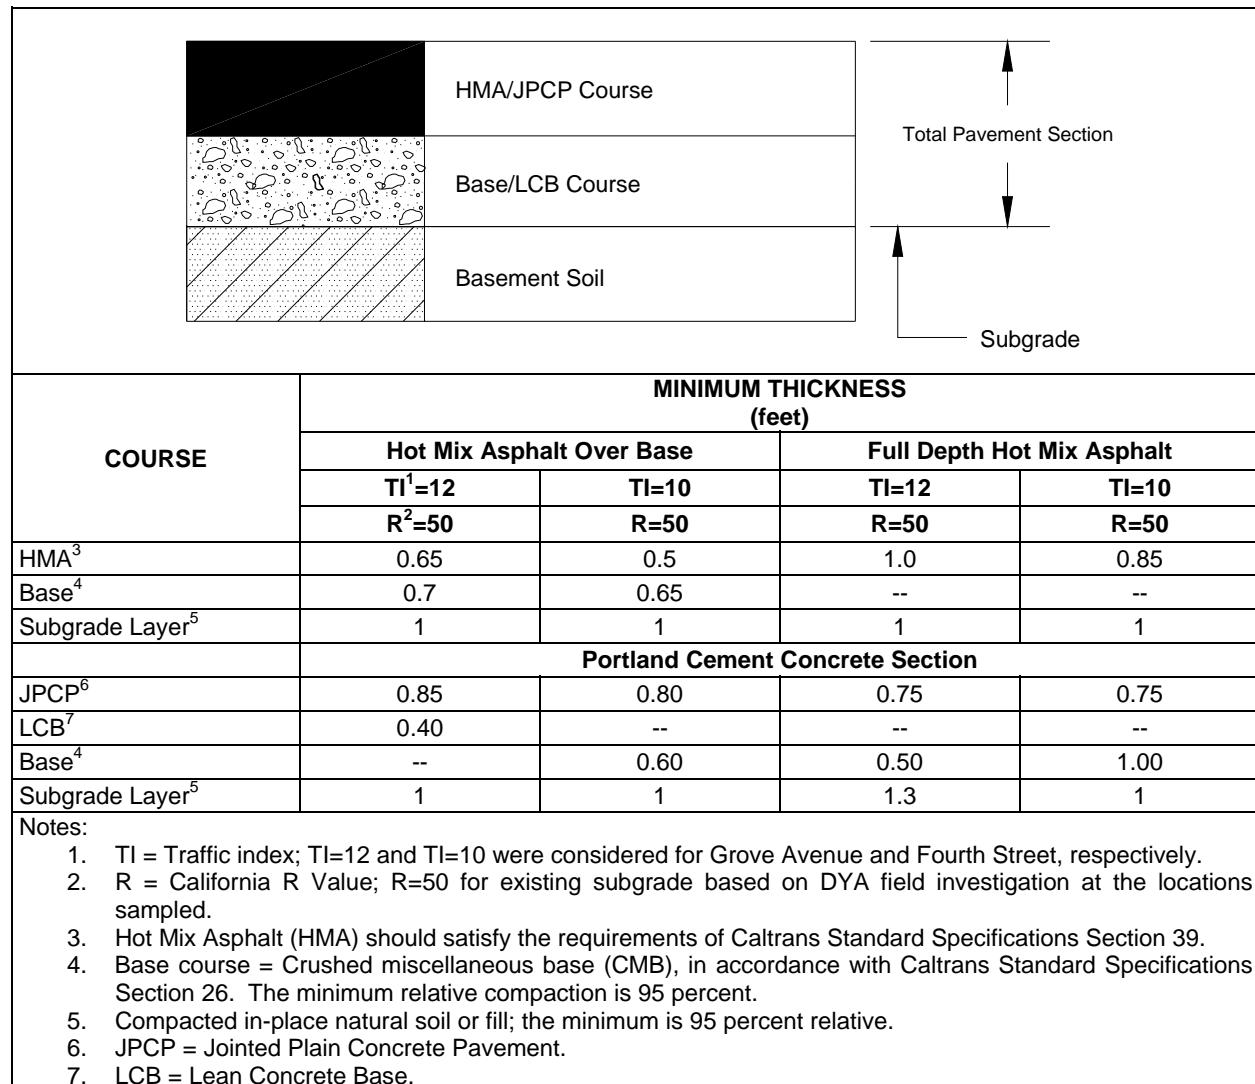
PAVEMENT THICKNESS RECOMMENDATIONS - GROVE AVENUE AND FOURTH STREET
